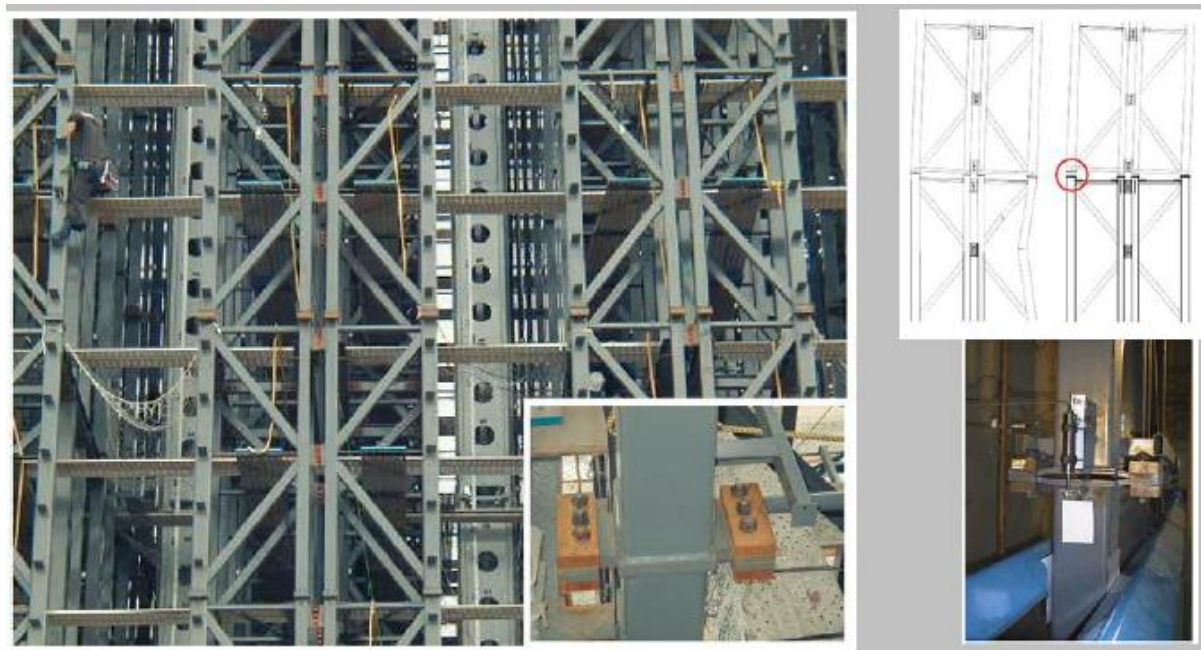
Providing uplift freedom at the splice location of steel columns' splicing in an industrial building (Wada, 2001)
